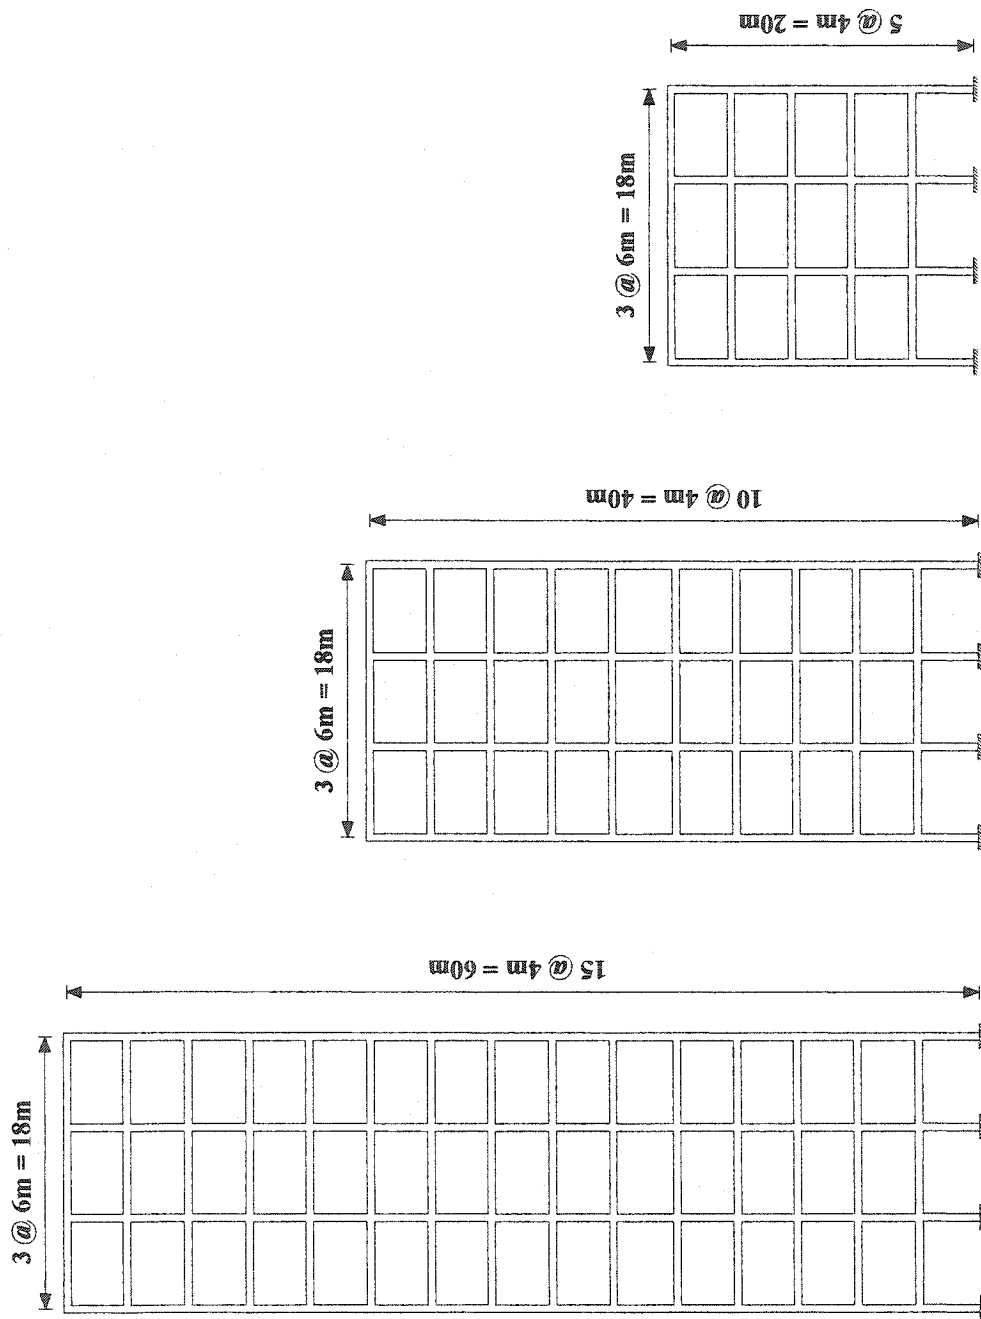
Elevation View of 15, 10 and 5-Storey Frame Buildings
